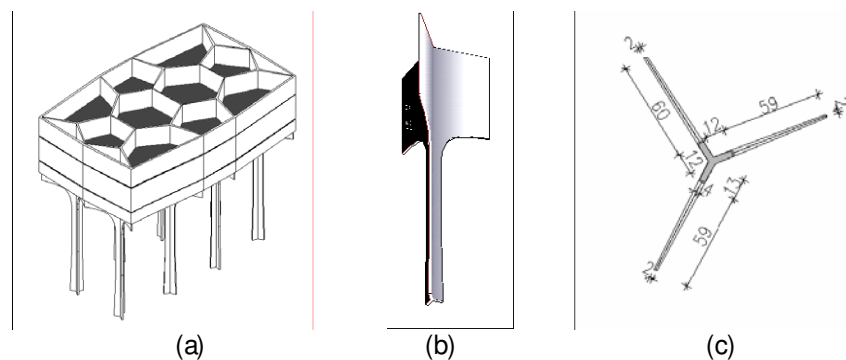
FIFA World Cup Pavilion, City of Kaiserslautern, Germany [26] – (a) Schematic view of pavilion; (b) & (c) geometry of a column (dimensions in cm).
